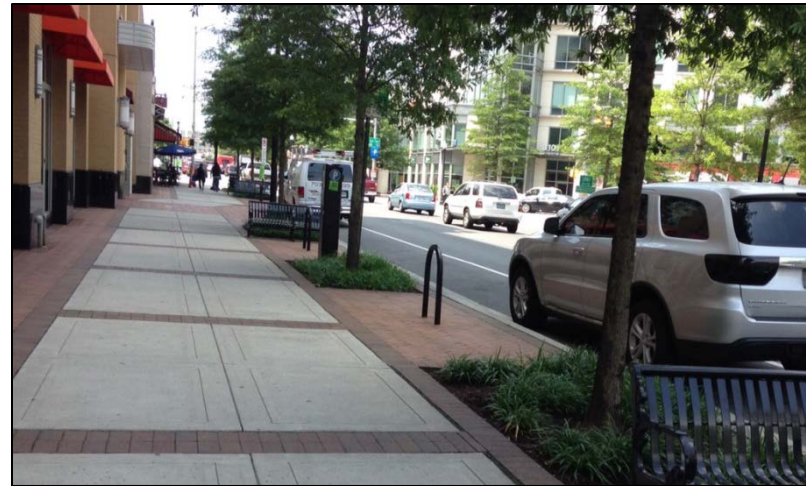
Brick banding surrounds concrete panels to create a decorative sidewalk.
